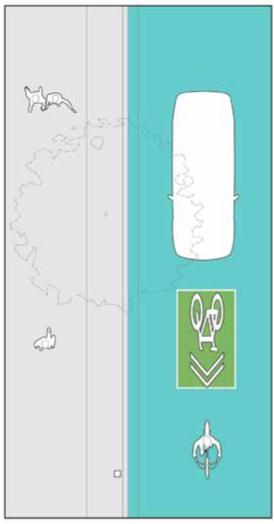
Typical Class III Bikeway with Intermittent Green Colored Shared-Lane Pavement Marking.
